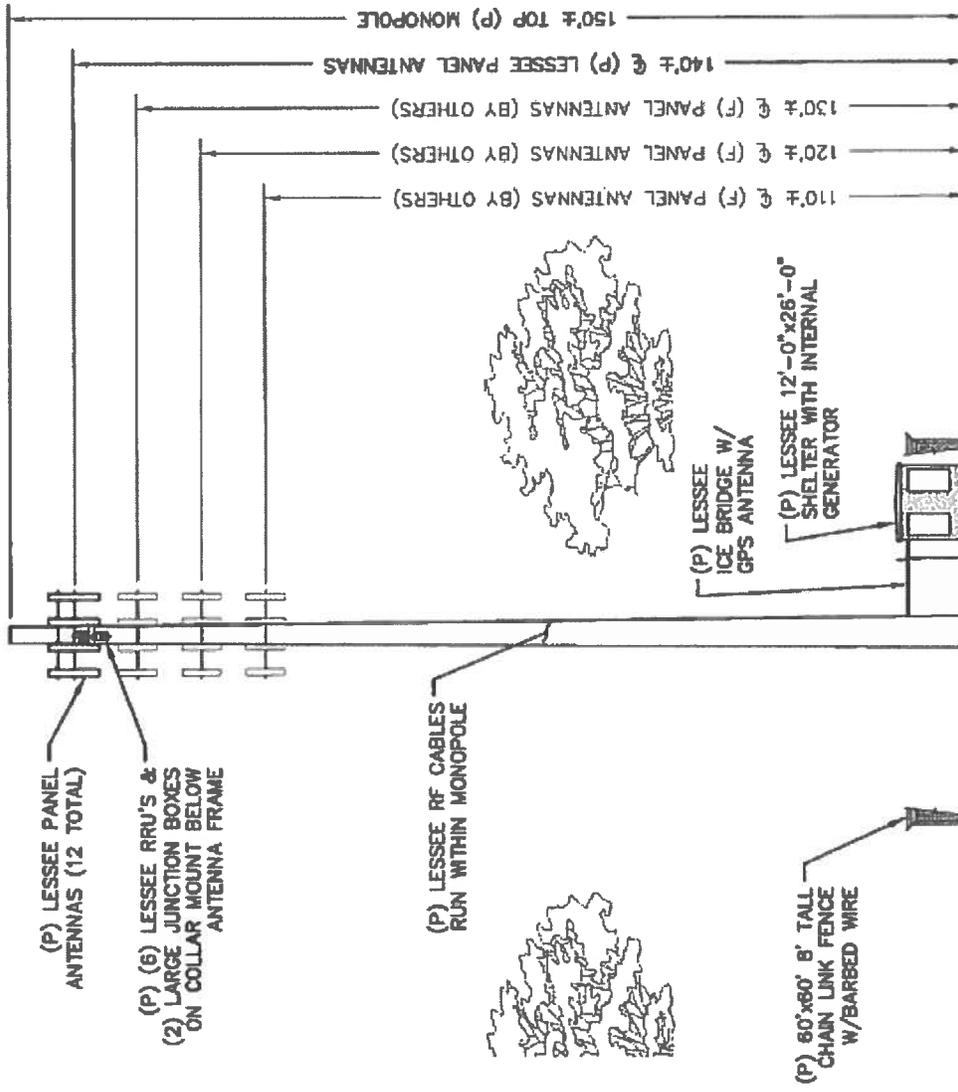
Exhibit A - Lease Exhibit – Town of Grafton – US Wireless, Inc. – East Elevation Plan
